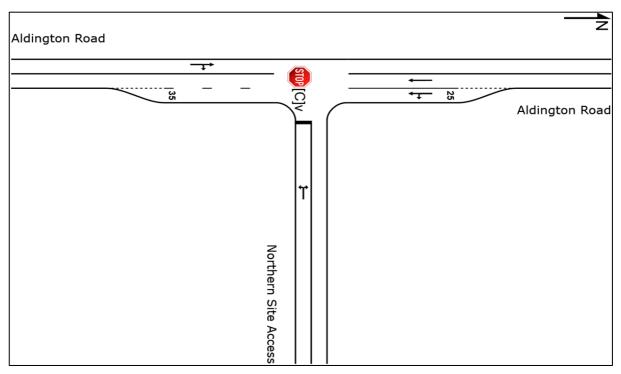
Aldington Road / Northern Site Access 2026 Intersection Layout
